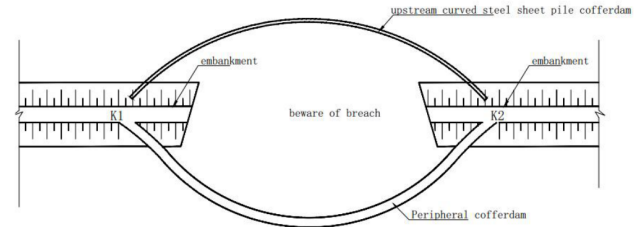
Plan of Cofferdam for Embankment Construction (Drawn by the author based on the proposed downstream cofferdam method).
